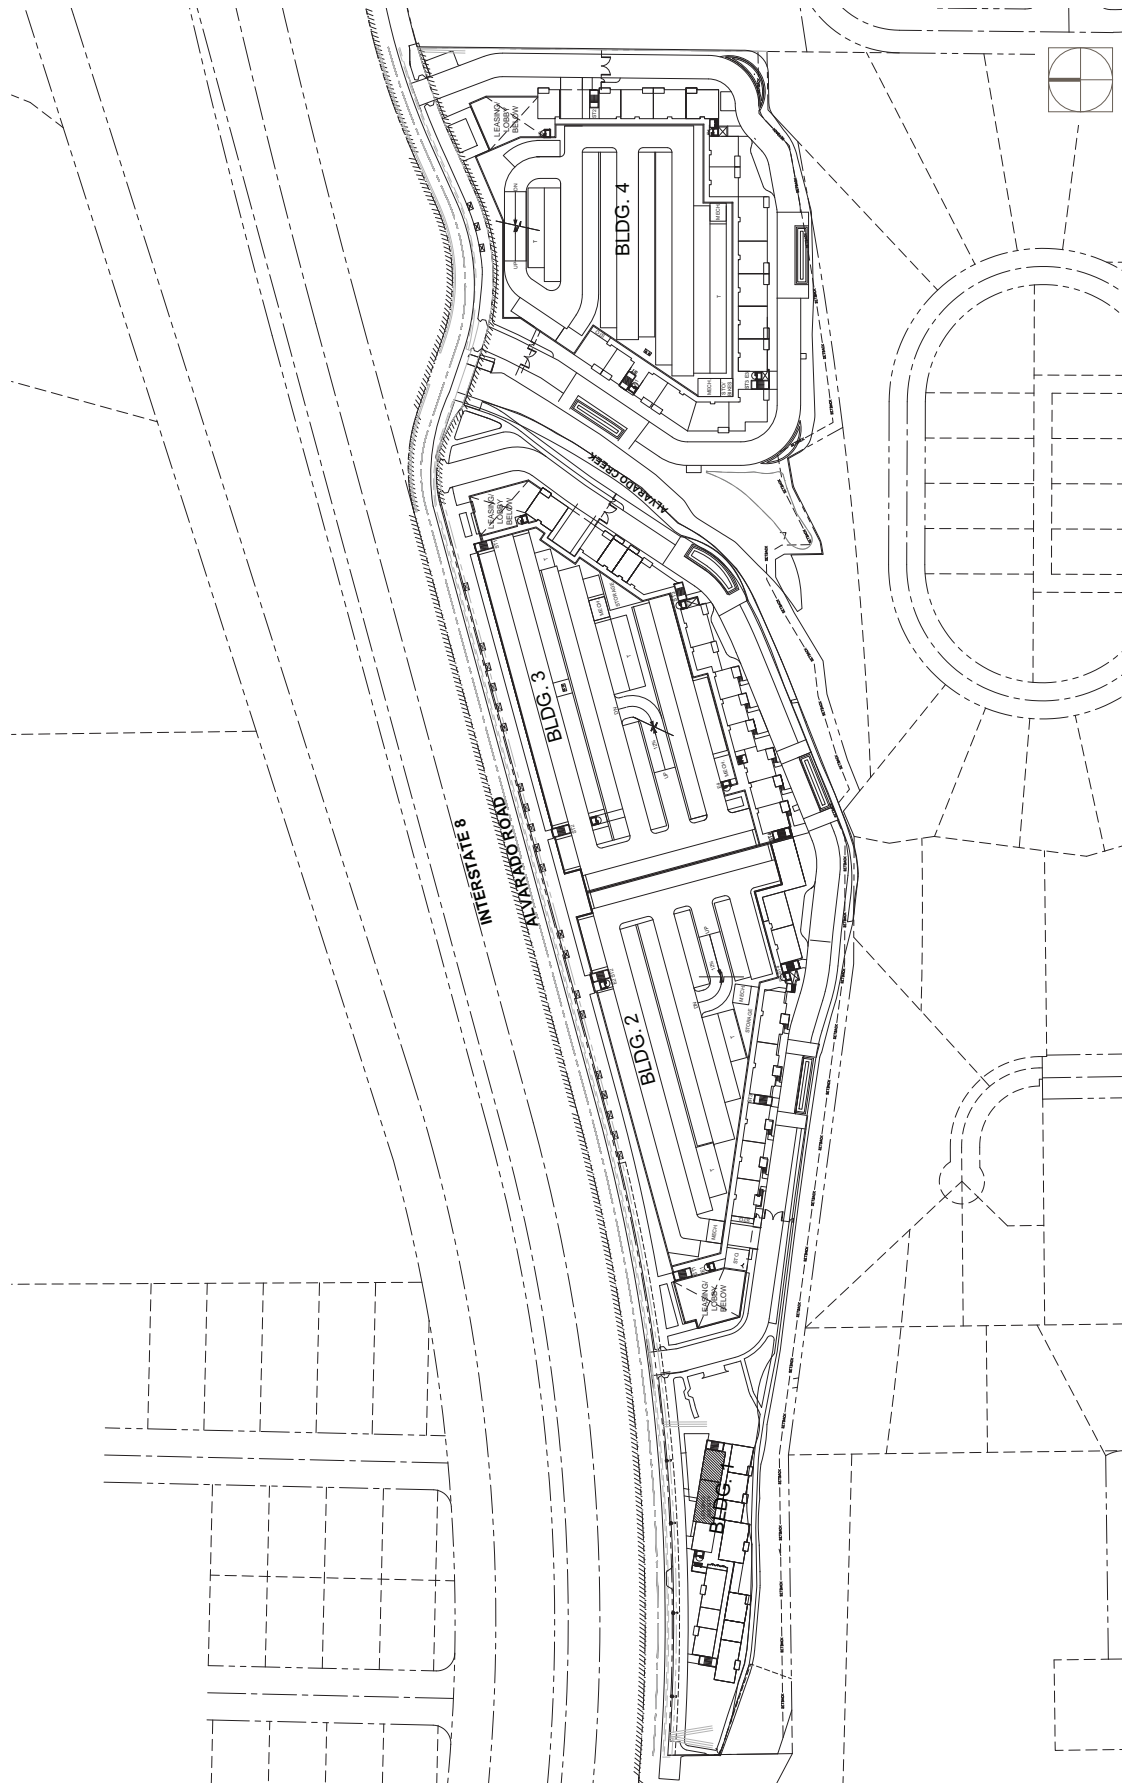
Form-Based Development Standards Typical Building Plan View at Second Floor
